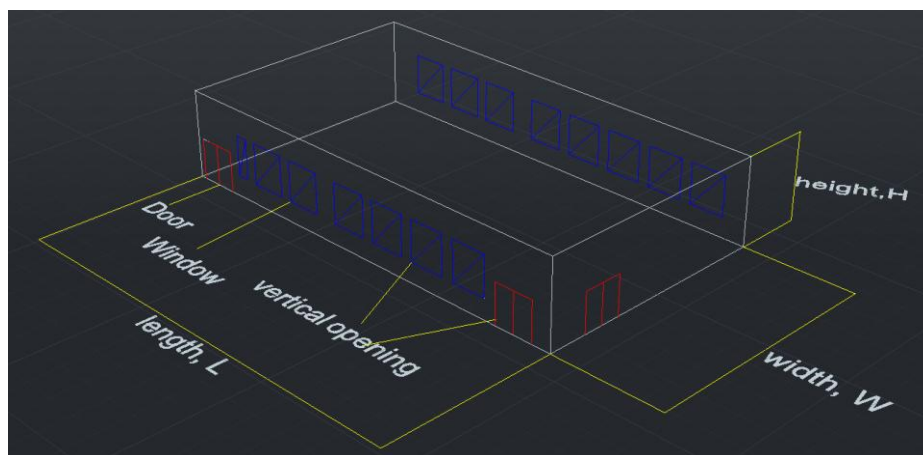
AutoCad drawing of multiple vertical openings presence in fire room for opening factor calculation.
